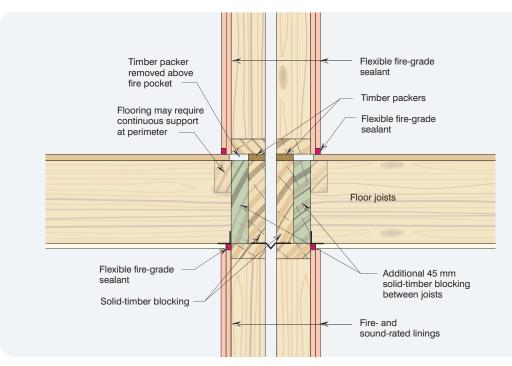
Joist supported by fire pockets in fire- and sound-rated wall – FRL 60 minutes – elevation view.
